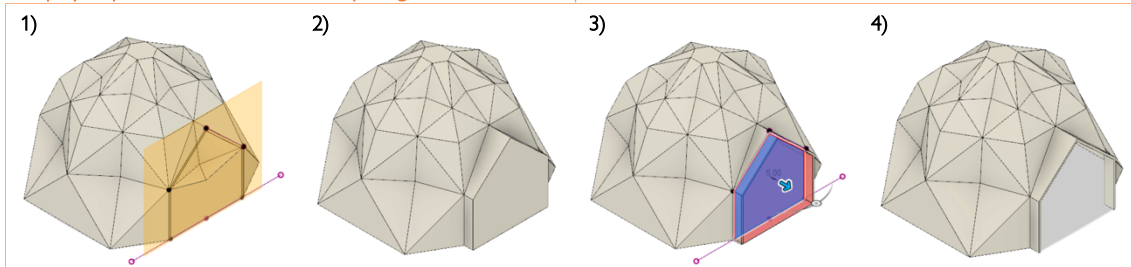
Steps of the modeling of the door opening. 1) Created a plan from two vertical edges, slicing the faces and created the door sketch; 2) Extruded the door sketch; 3) Extrude-cut the opening for the door with 4 mm thickness; 4) Final model with the door opening.
